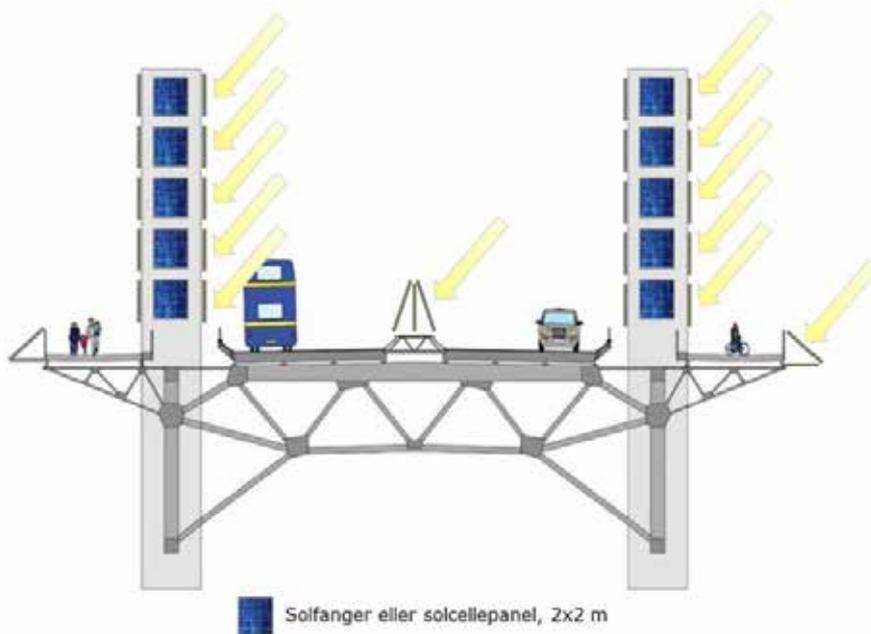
Panels mounted on the pylons and the sides of a suspension bridge, Rambøll
